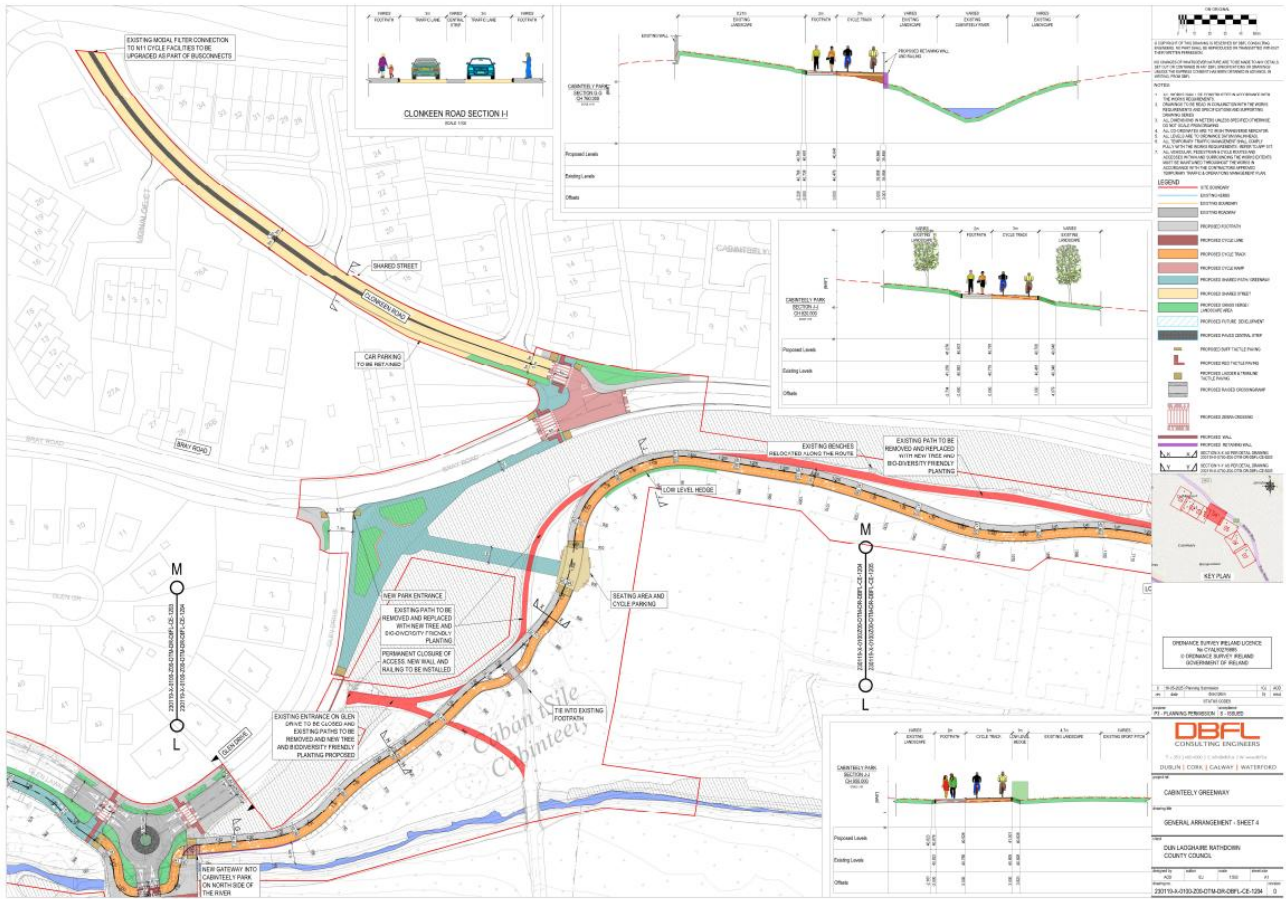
Proposed Section C(1) of Cabinteely Greenway (Source: DBFL Consulting Engineers)
